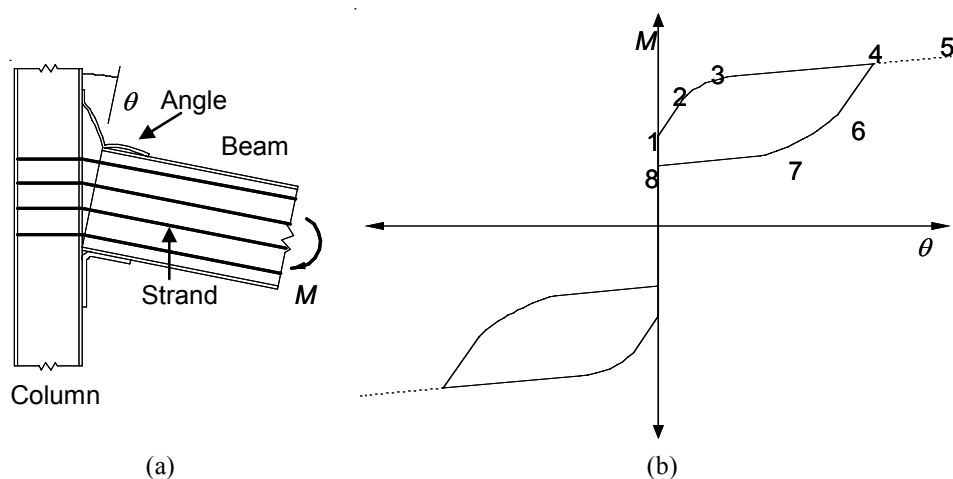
Behavior of self-centering system for beam-to-column connection:
